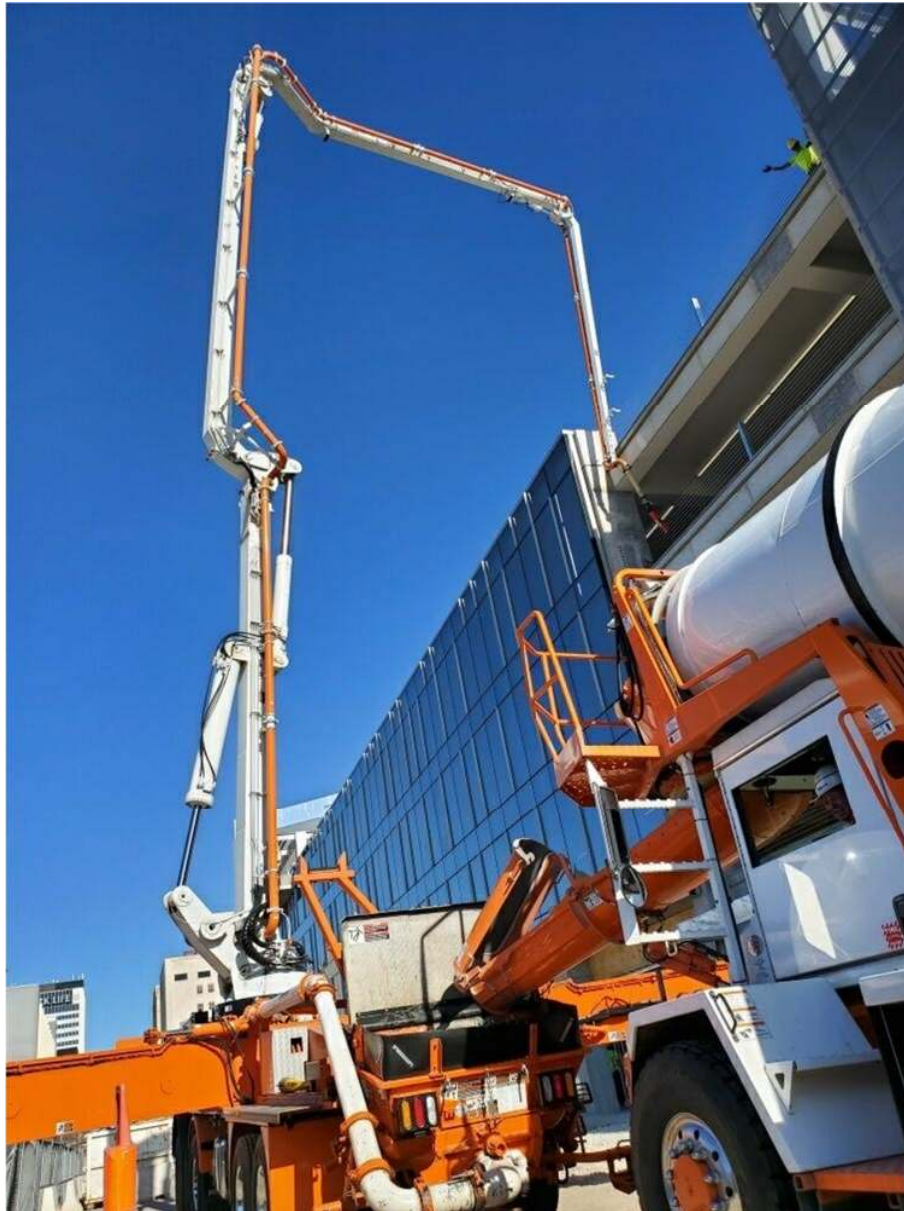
Pumping EdenCrete® concrete to fourth floor level of carpark
